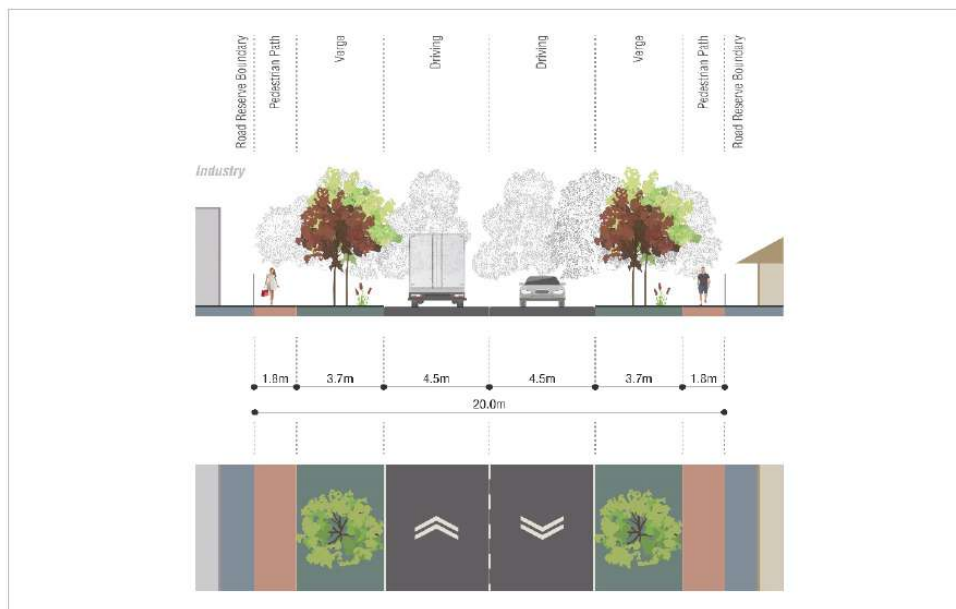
RD19 Brand Road (South of District Open Space) Cross Section
